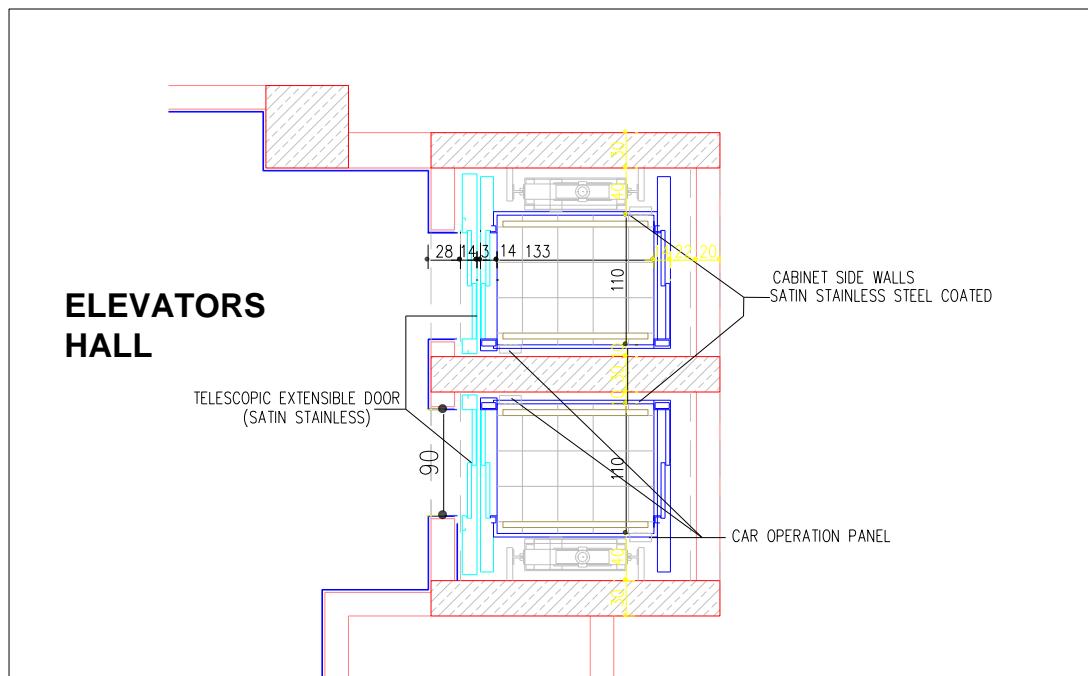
Typical plan of one of the elevators in Forum Ankara.
